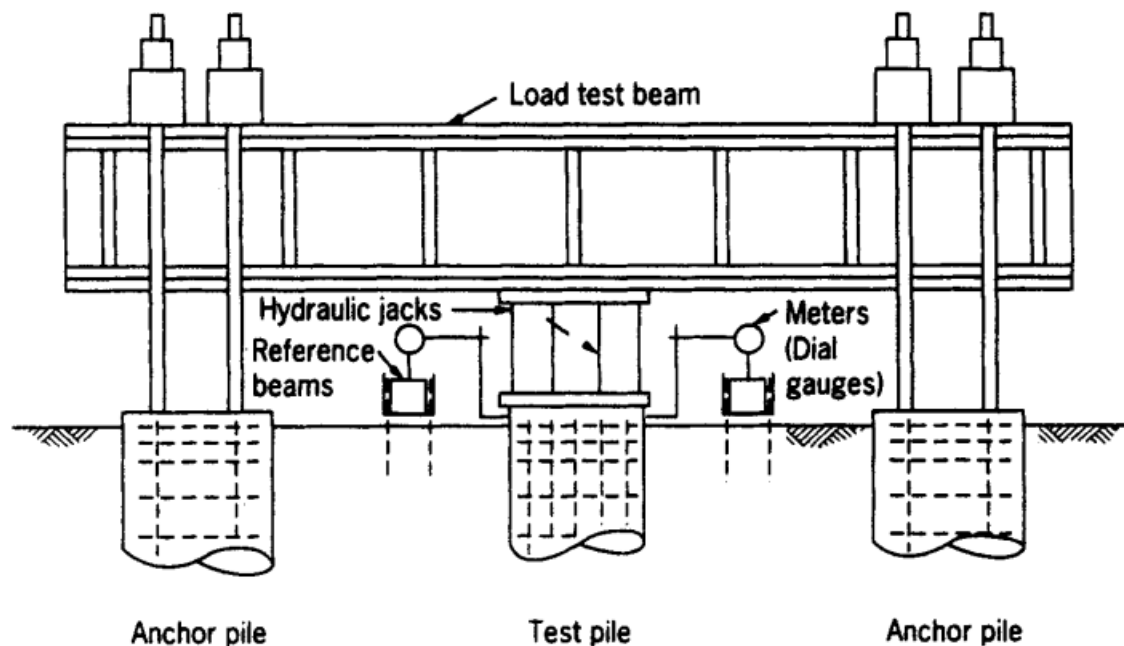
Typical setup for Pile Load Test in Compression using Anchor Piles. (Sharma et al., 1984)
